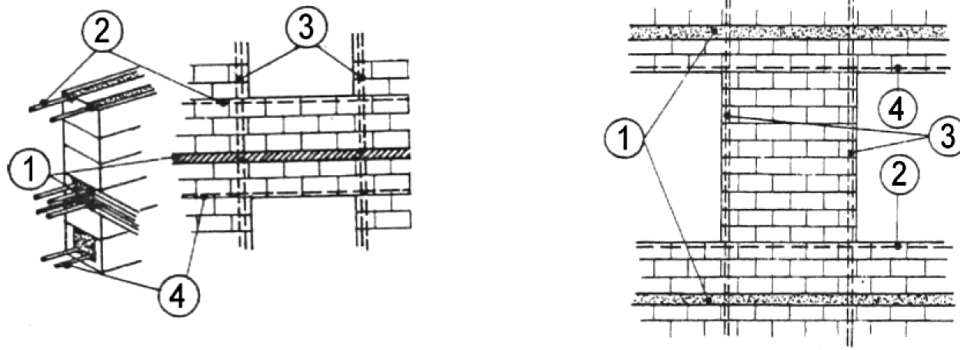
Reinforcement of the spandrel between two overlying openings (left) and reinforcement of window pier (right); 1. Tie-beams, 2. Reinforcement of threshold, 3. Vertical reinforcement, 4. Lintel reinforcement (from Giuffrè, 1980).
